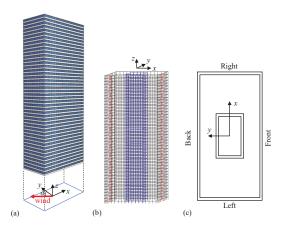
Schematic of the building system: (a) the building envelope, (b) the structural system, and (c) plan view of the building.
